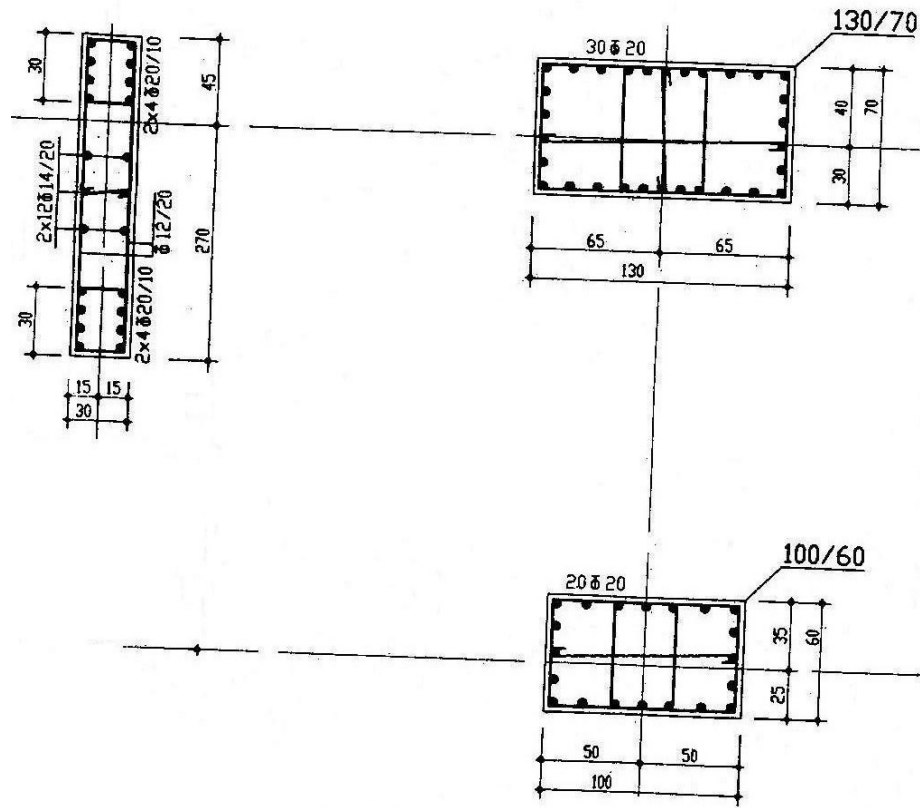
Typical reinforcement plan of the 24-storey high building
